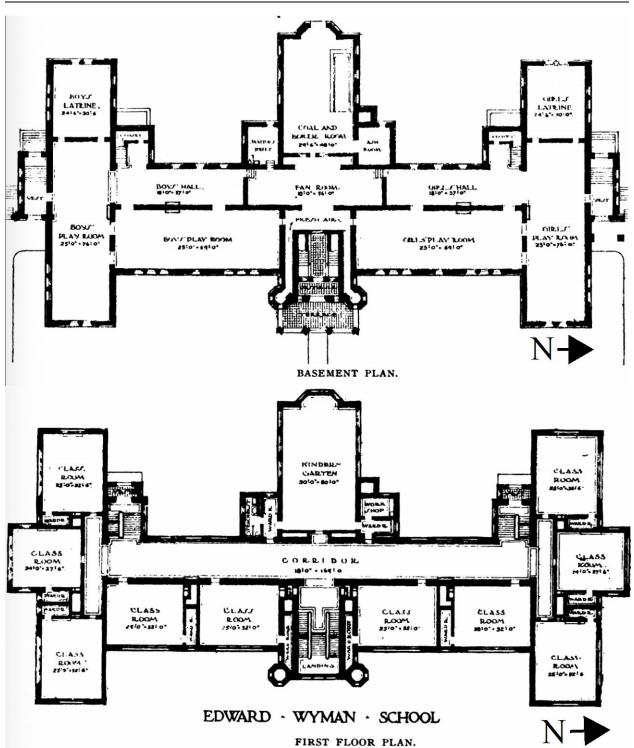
Edward Wyman School Floor Plans (Inland Architect and News record, 1905).
